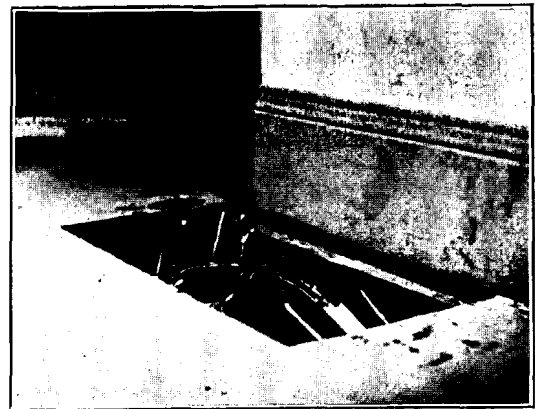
SHOWING METHOD OF BUILDING-UP CABLES.
